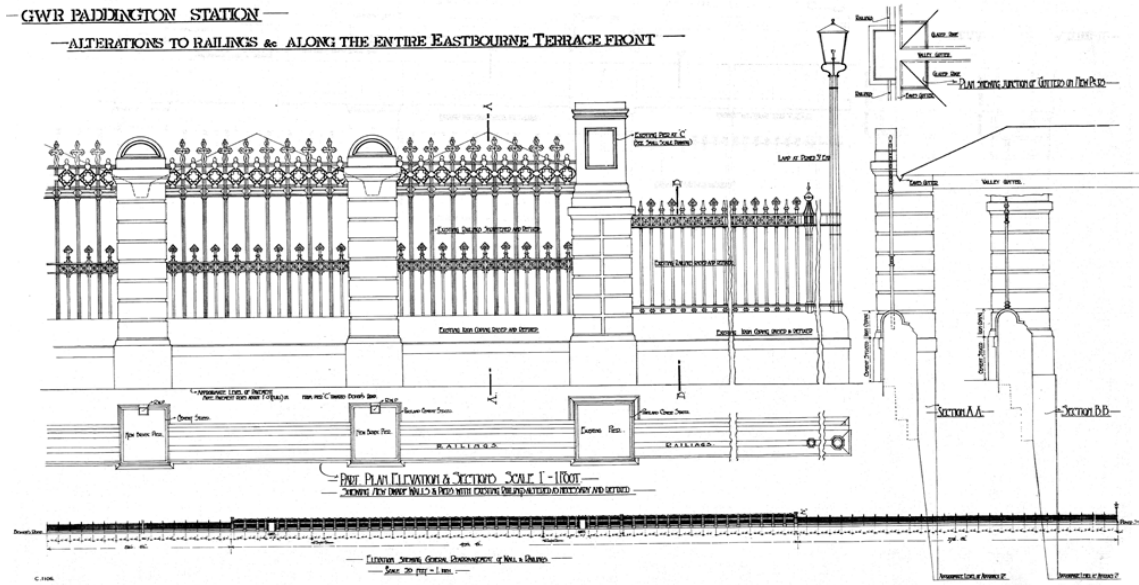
Early 20<sup>th</sup> century modifications to the railings and retaining wall of Departures Road (Network Rail Archive DMFP60017493)
